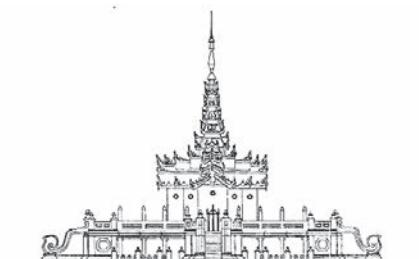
East Elevation of Shwe-In-Bin Kyaung^{*11}
